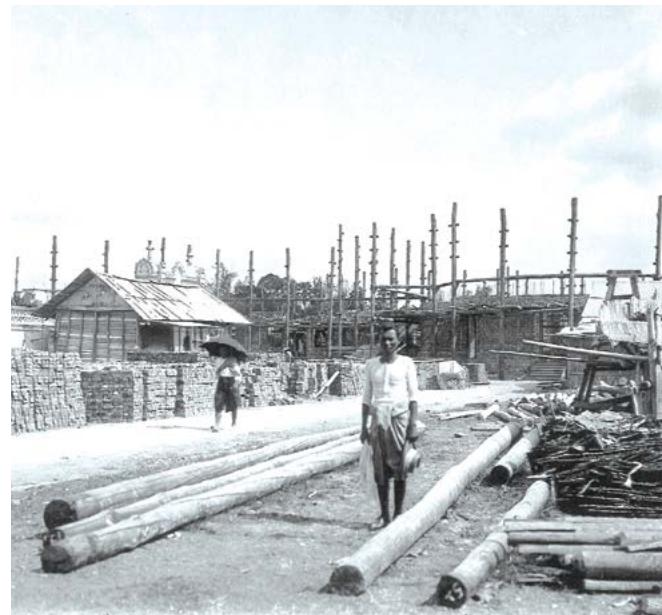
Brickwork at the Ananta Samakhom Throne Hall under construction, 1909, with scaffolding and stocked pressed bricks © NAT
